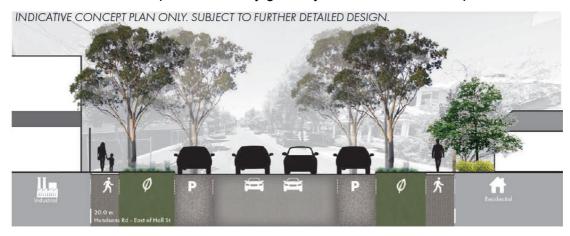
Proposed cross section for Hudsons Road East from *Draft Spotswood Activity Centre Structure Plan, March 2022
